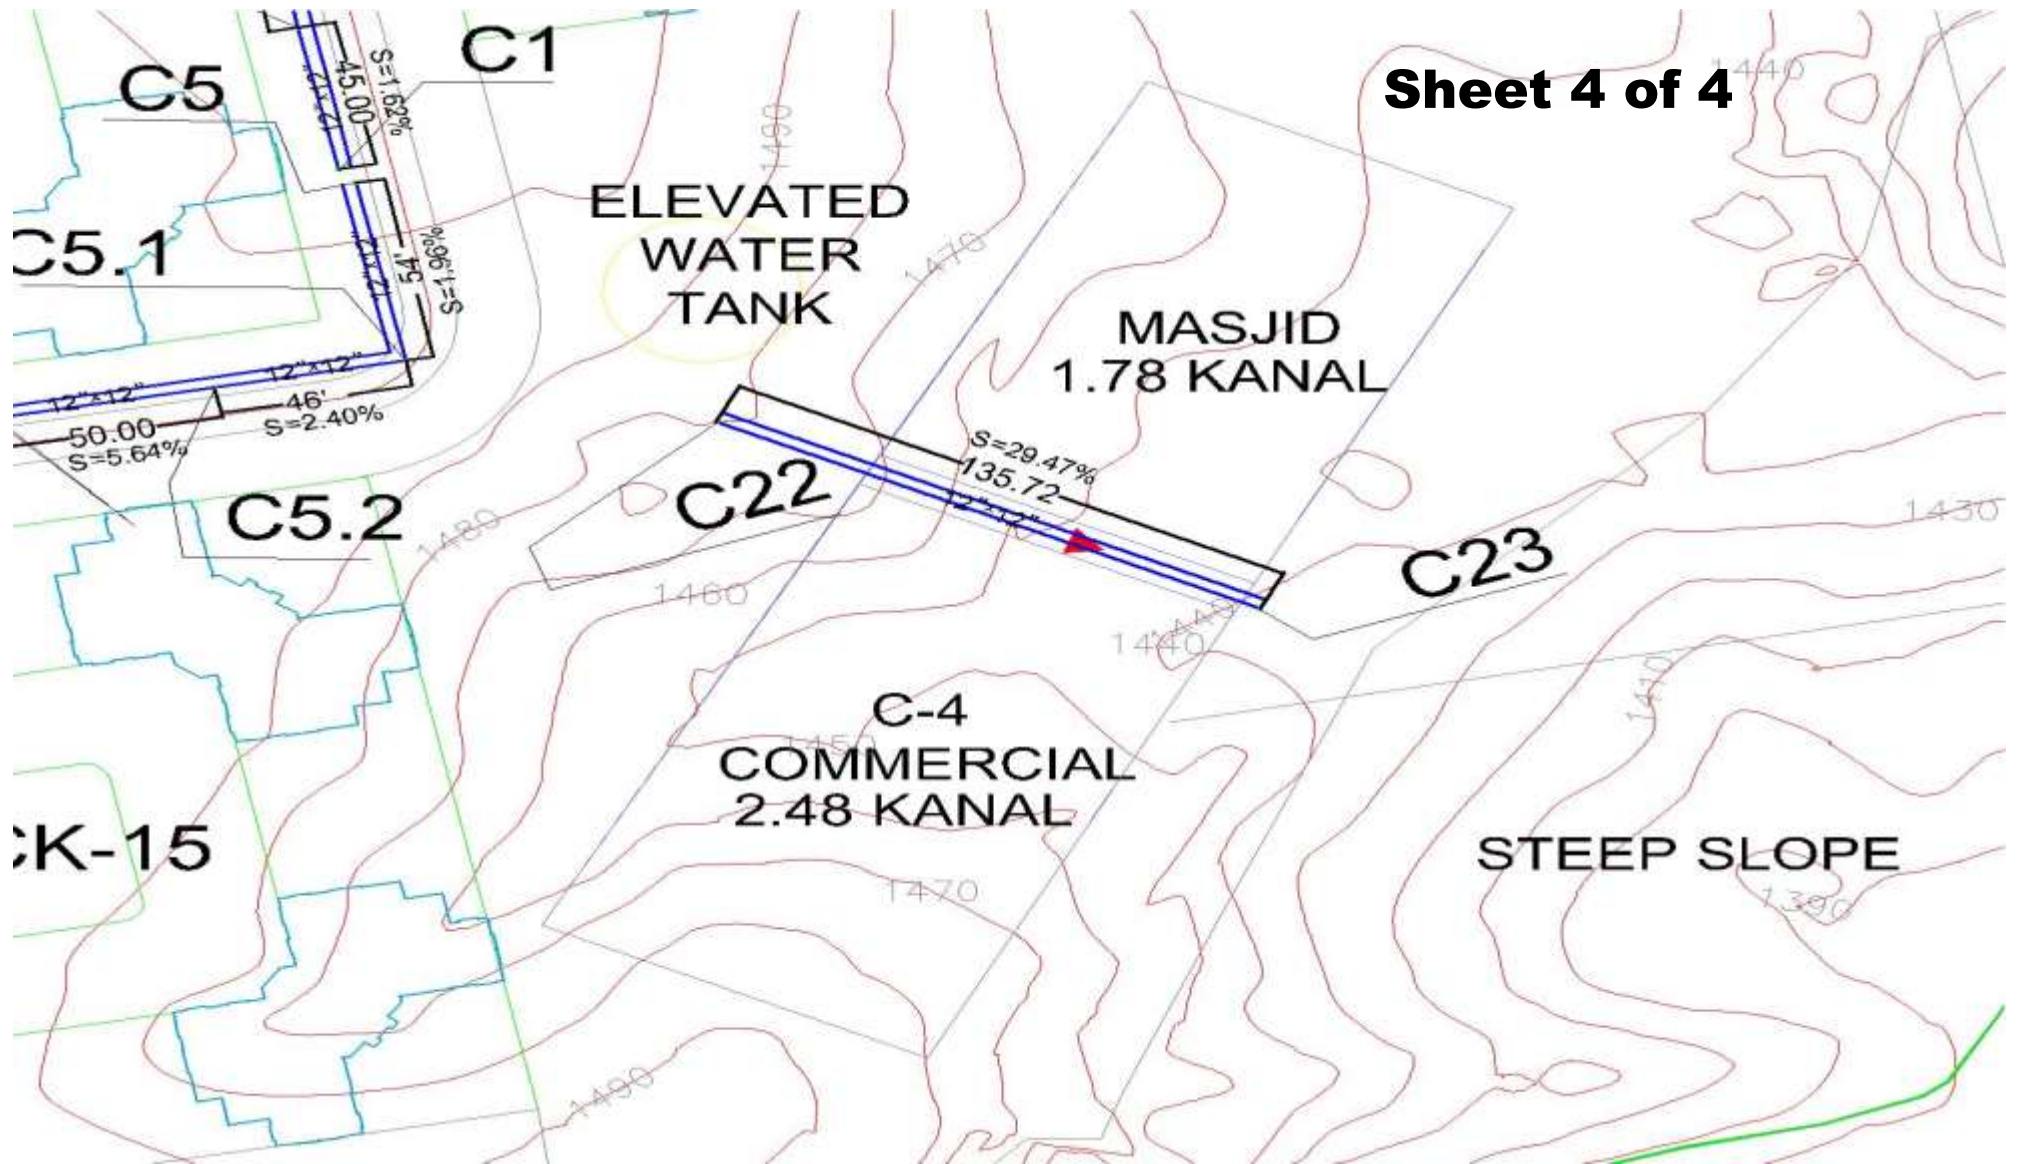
Storm drainage layout plan of Sub-catchment-13 showing final disposal node C23
